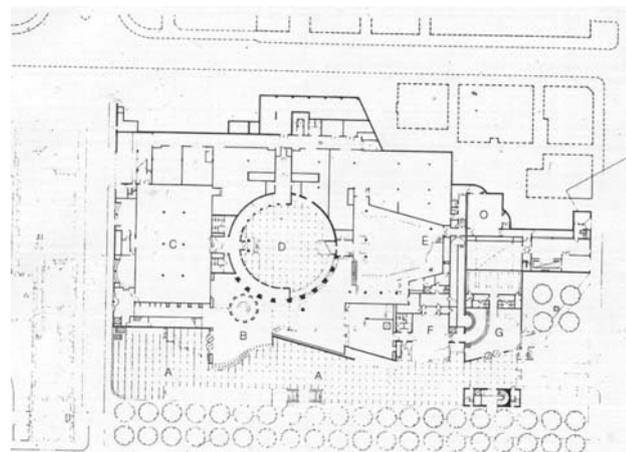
Neue StattsGalerie , Groud Floor Plan (Çimen 1989,p.68)
